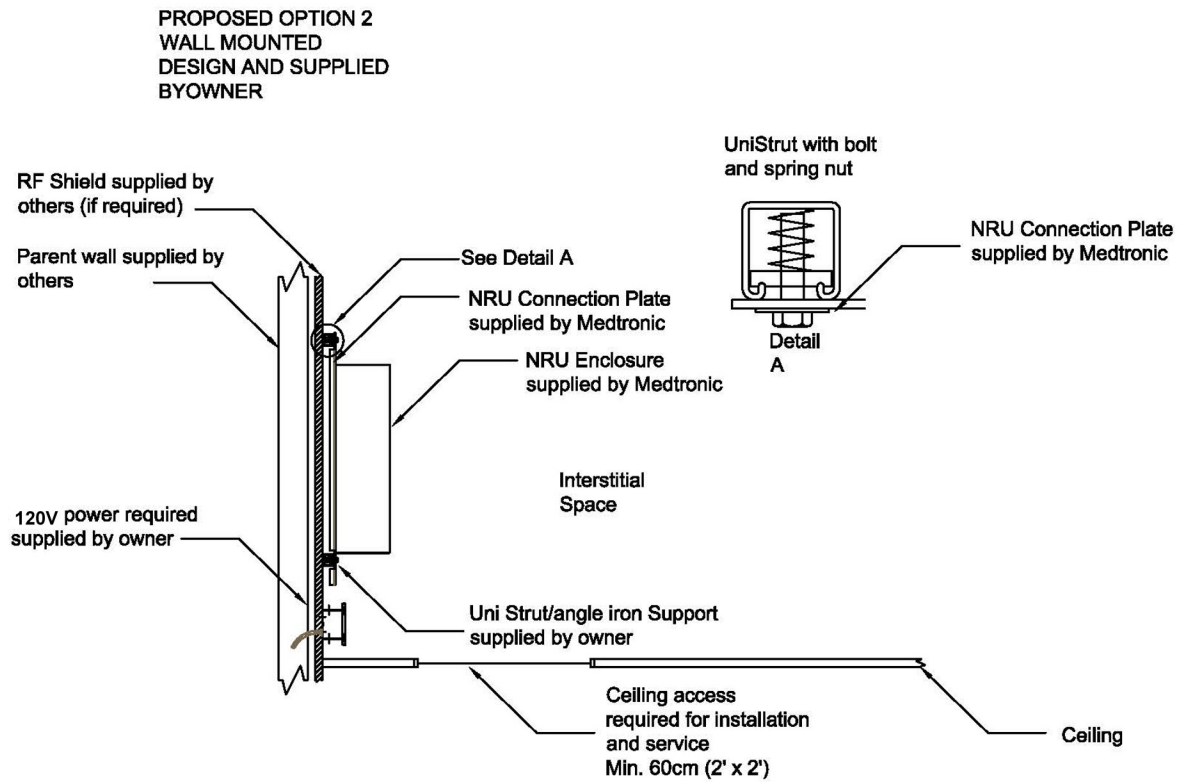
Proposed detail for unistrut vertically mounted NRU
